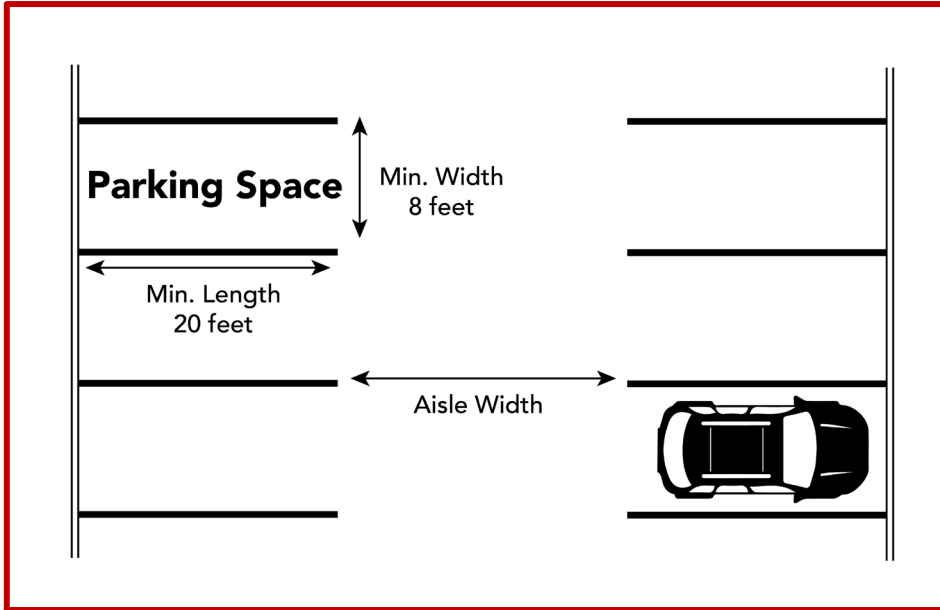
Parking Stall and Aisle Way Dimensions, 90-degree
